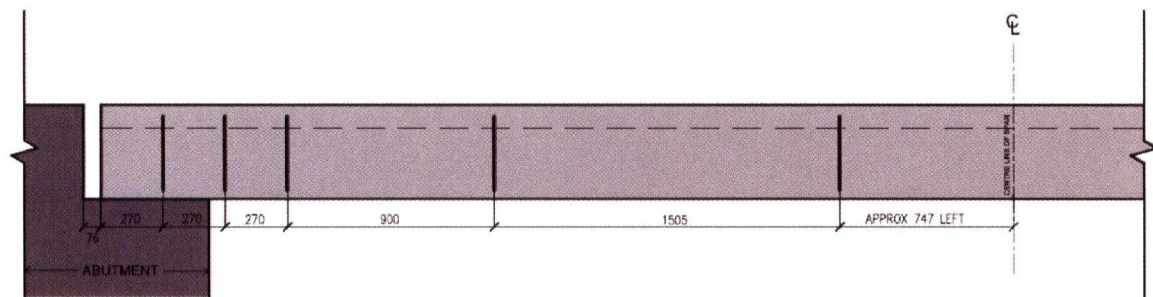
Stirrup Spacing of Safe Bridge's Channel Beam Girders
